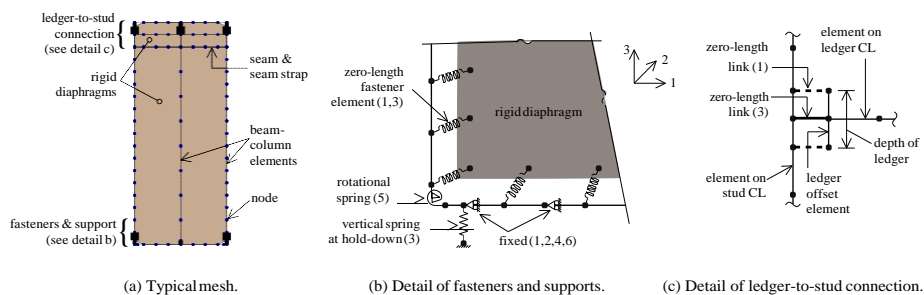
Example computational Model: (a) full wall, (b) base and fastener details, and (c) ledger track details
